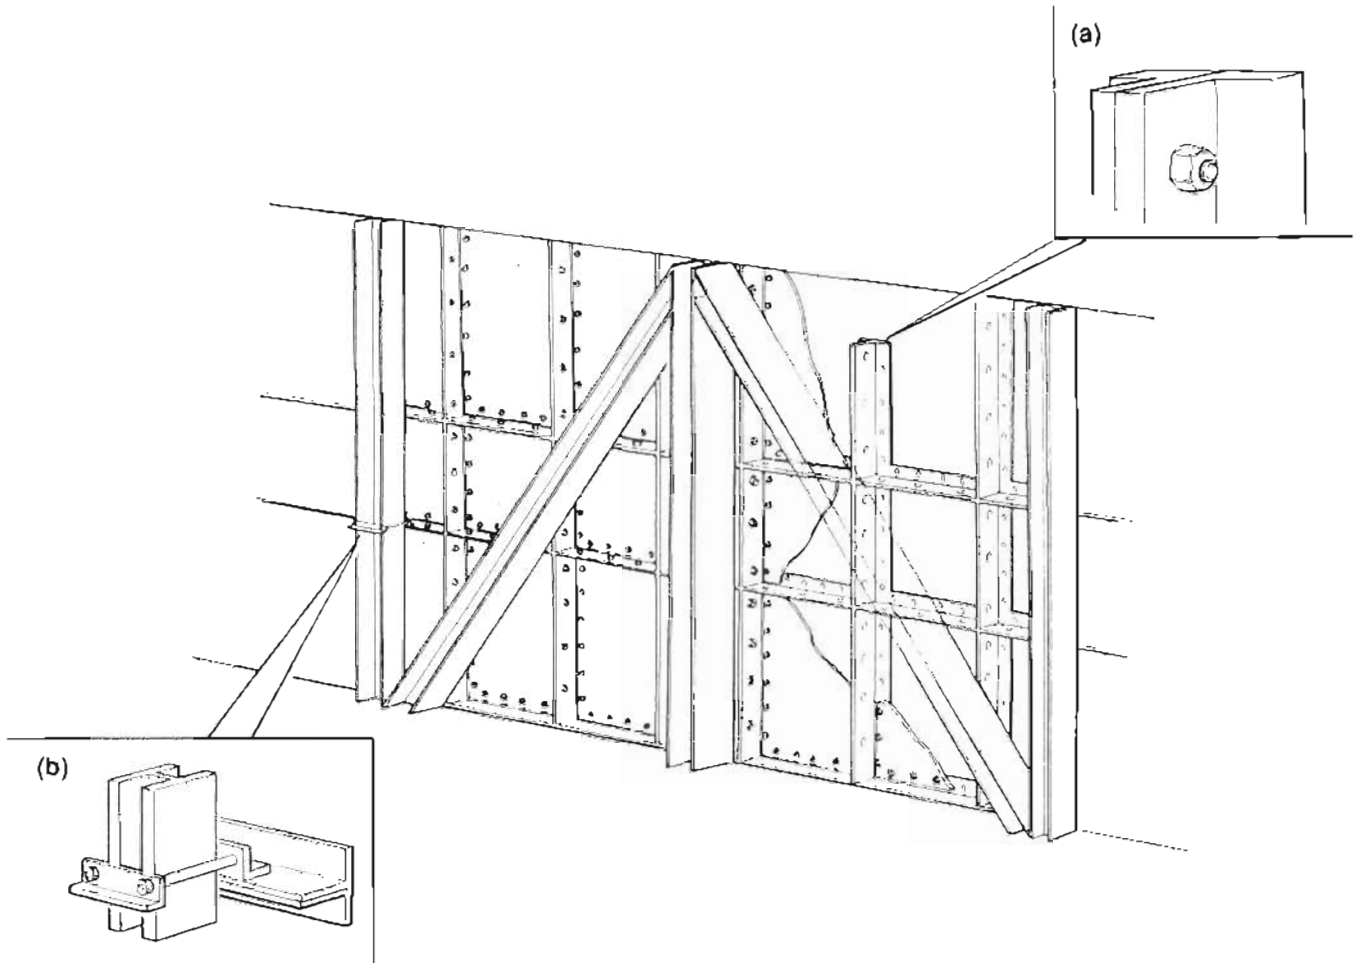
Schematic of single-layer firewall between B and C Modules: insert (a) frame bolt; insert (b) clamps.
